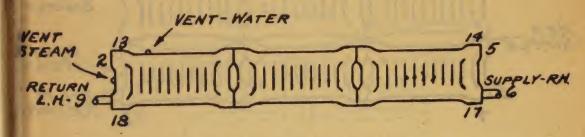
Assembled in single tier. Water or one and two pipe steam.
